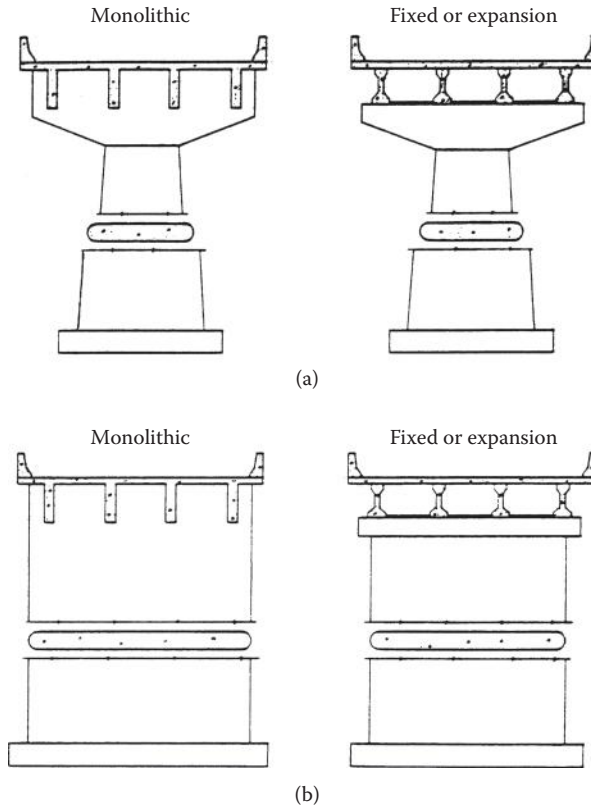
Typical pier types and configurations for river and waterway crossings: (a) Hammerhead (b) Solid wall.
